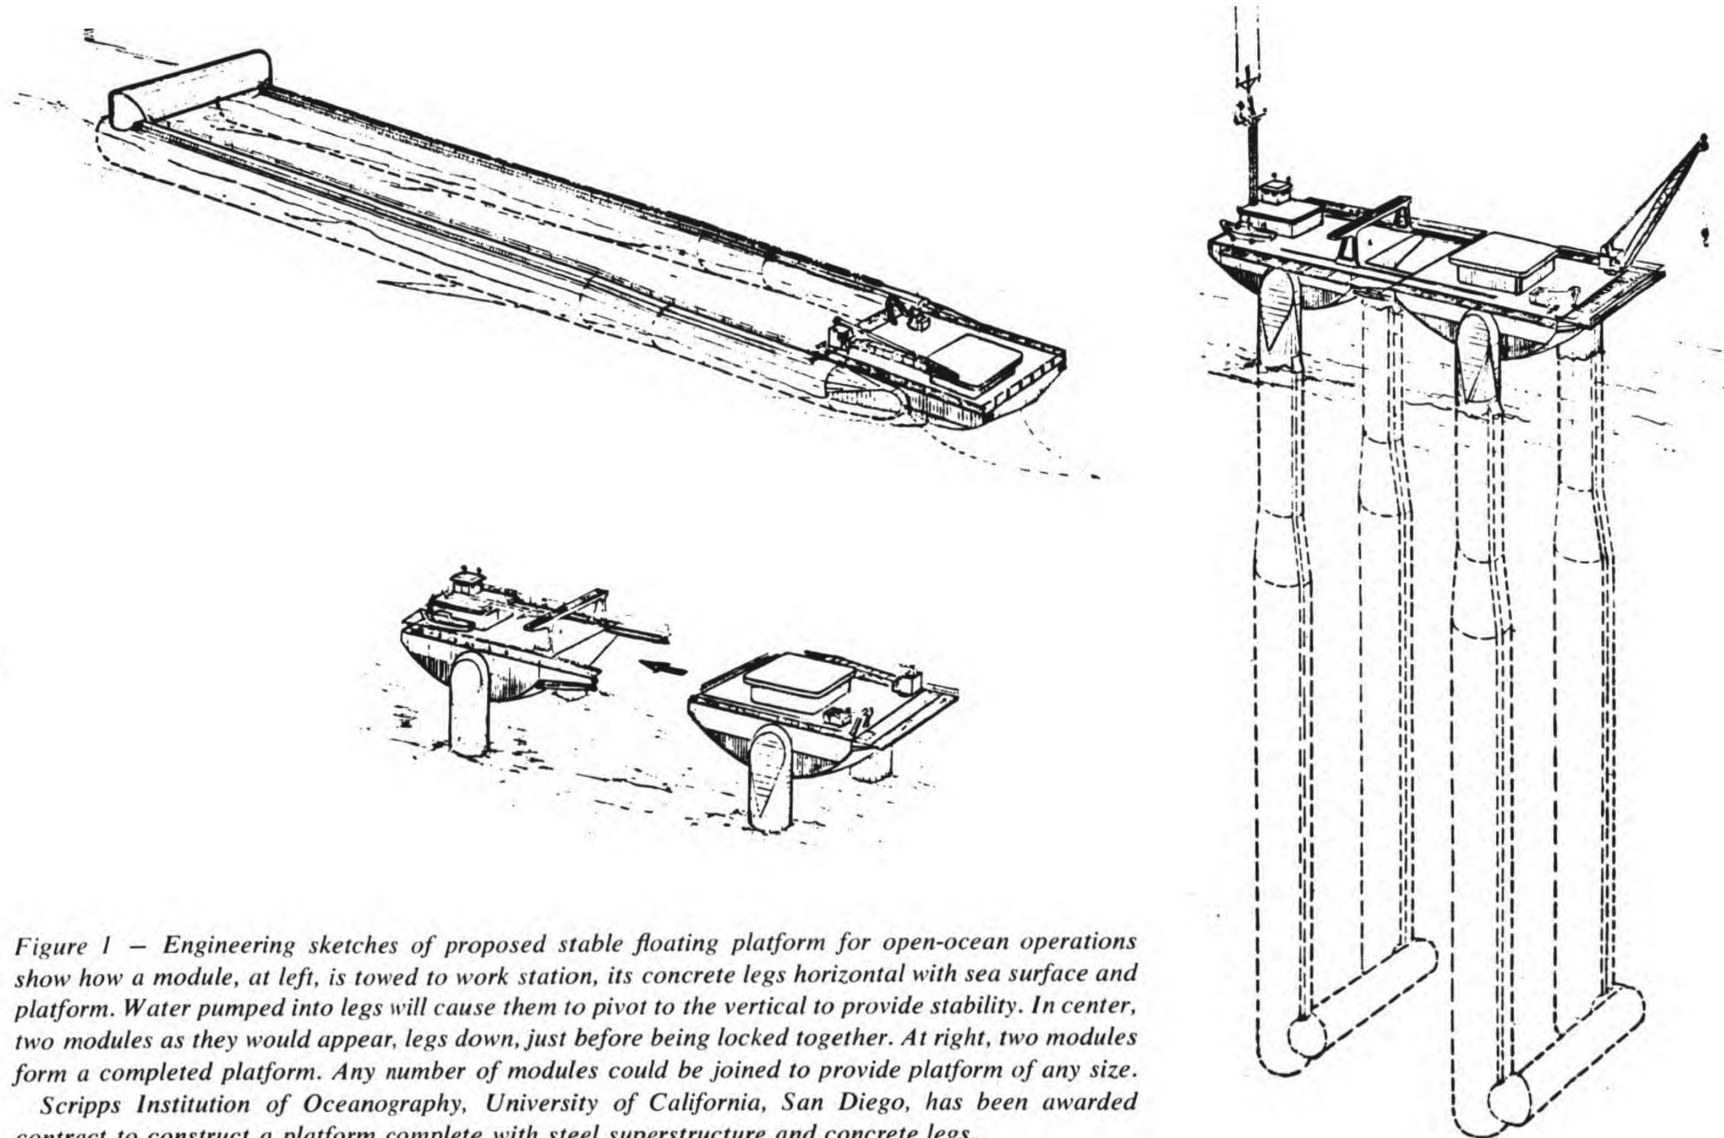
Engineering sketches of proposed stable floating platform for open-ocean operations show how a module, at left, is towed to work station, its concrete legs horizontal with sea surface and platform. Water pumped into legs will cause them to pivot to the vertical to provide stability. In center, two modules as they would appear, legs down, just before being locked together. At right, two modules form a completed platform. Any number of modules could be joined to provide platform of any size. Scripps Institution of Oceanography, University of California, San Diego, has been awarded contract to construct a platform complete with steel superstructure and concrete legs.
